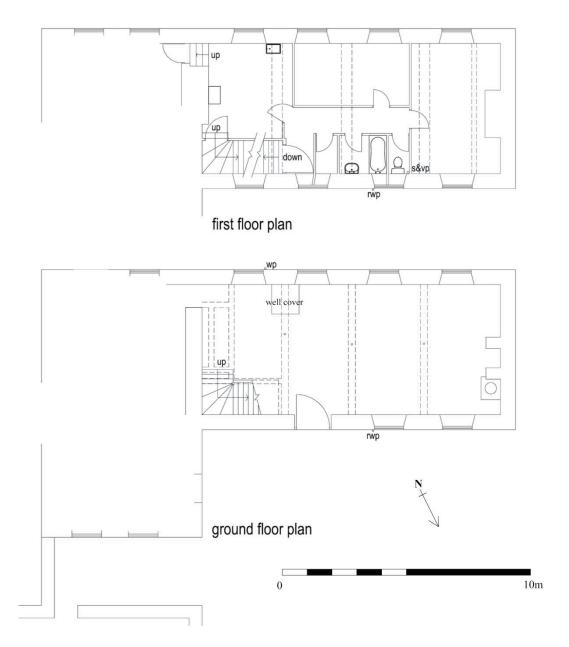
Plan of Laundry Plan supplied by David Todd Architecture
